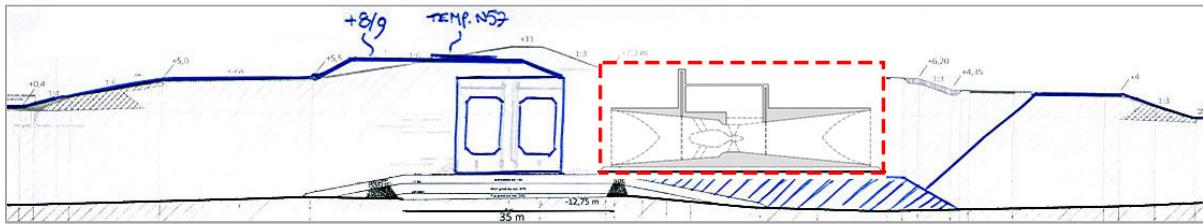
Variant 1A 'Building in the dry' cross-section during construction
